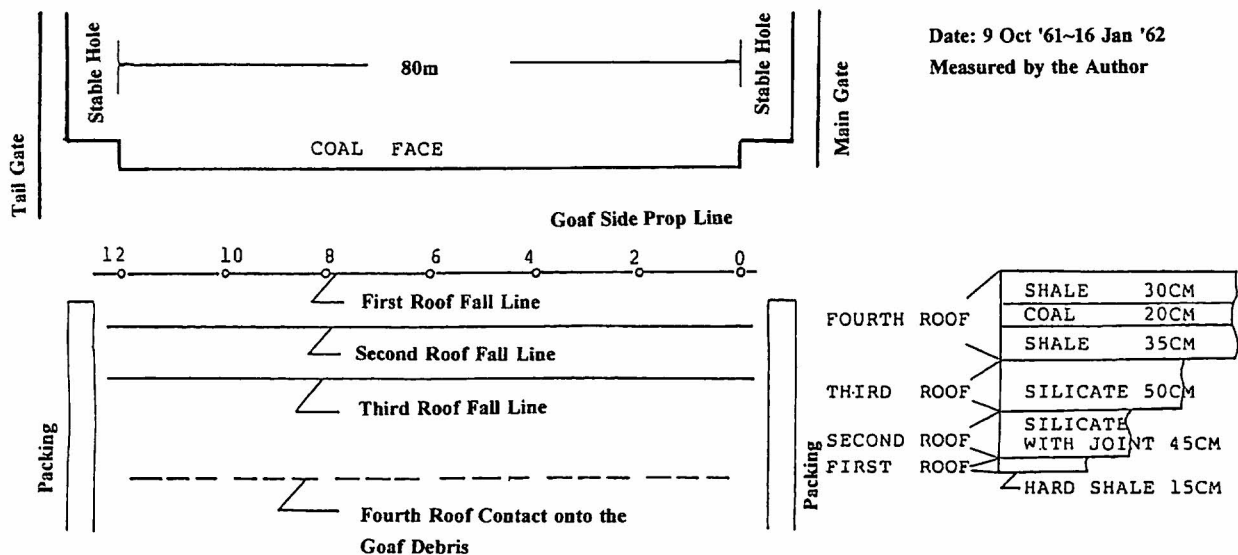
Prefactory Explanations on the Roof Fall at West No.10 Level No.6 Longwall
